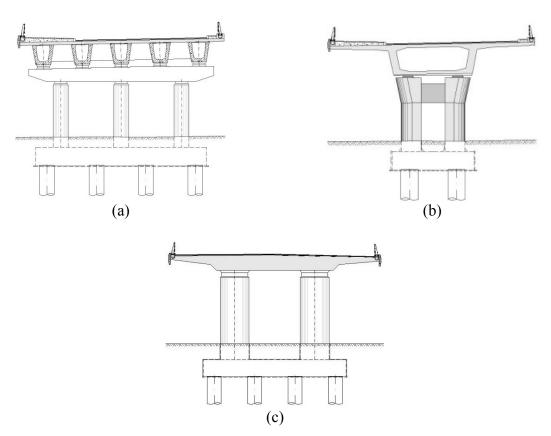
SeeBridge Bridge Types: (a) Concrete Beam/Girder Bridge, (b) Concrete Box Girder Bridge, (c) Concrete slab Bridge
